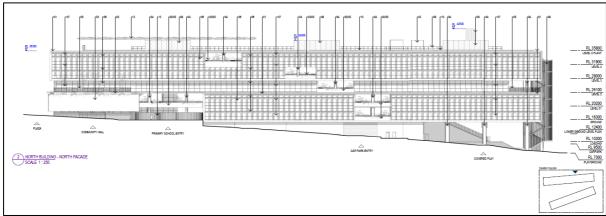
| Northern elevation of the building fronting Rhodes Street (Source: Applicant's RRAI 2020)
